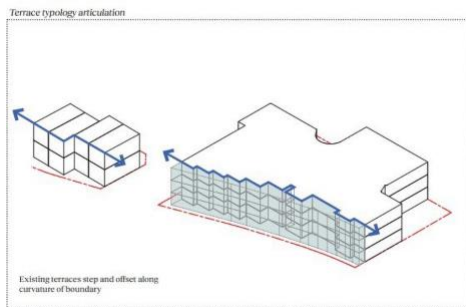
The proposed building is offset to Wentworth Park Road as are the neighbouring terraces. The terraces however have pitched roofs, though they have been omitted from the above diagram which seeks to argue that the large flat roofed building proposed echoes the terrace house form of its neighbours. (Image: <https://tinyurl.com/3a58pve4>)
